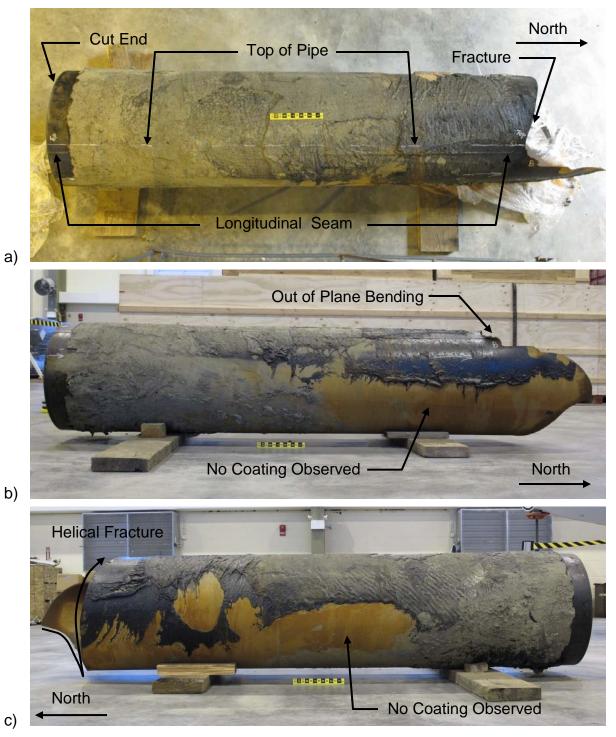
Southern section of pipe as received; a) Top side of pipe; b) East side of pipe; c) West side of pipe.
